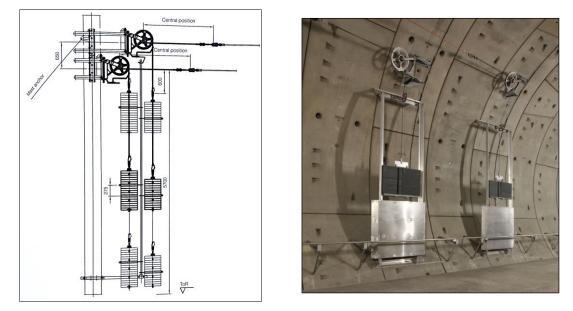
Sectioning device in an open section (picture on the left side) (Kiessling 2009), and tensioning device in a tunnel section (picture on the right side) (Dr. Fockenberg 2013)
